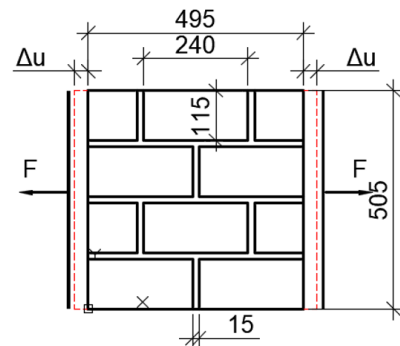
Geometry and configuration of tensile tests (the dimension is in millimet)
